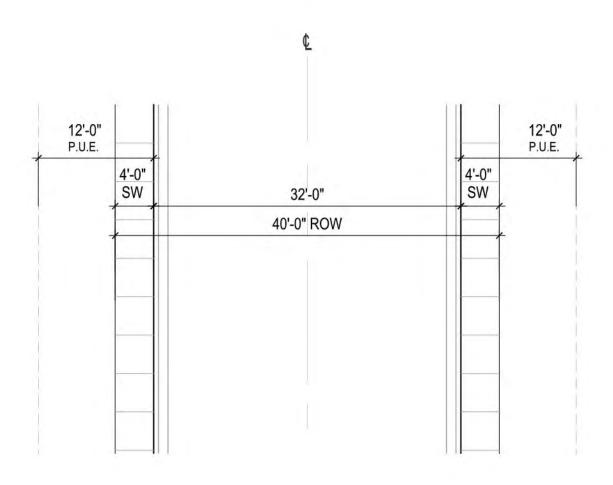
EXHIBIT L: STREET SECTIONS H - NON-RESIDENTIAL LOCAL STREET
